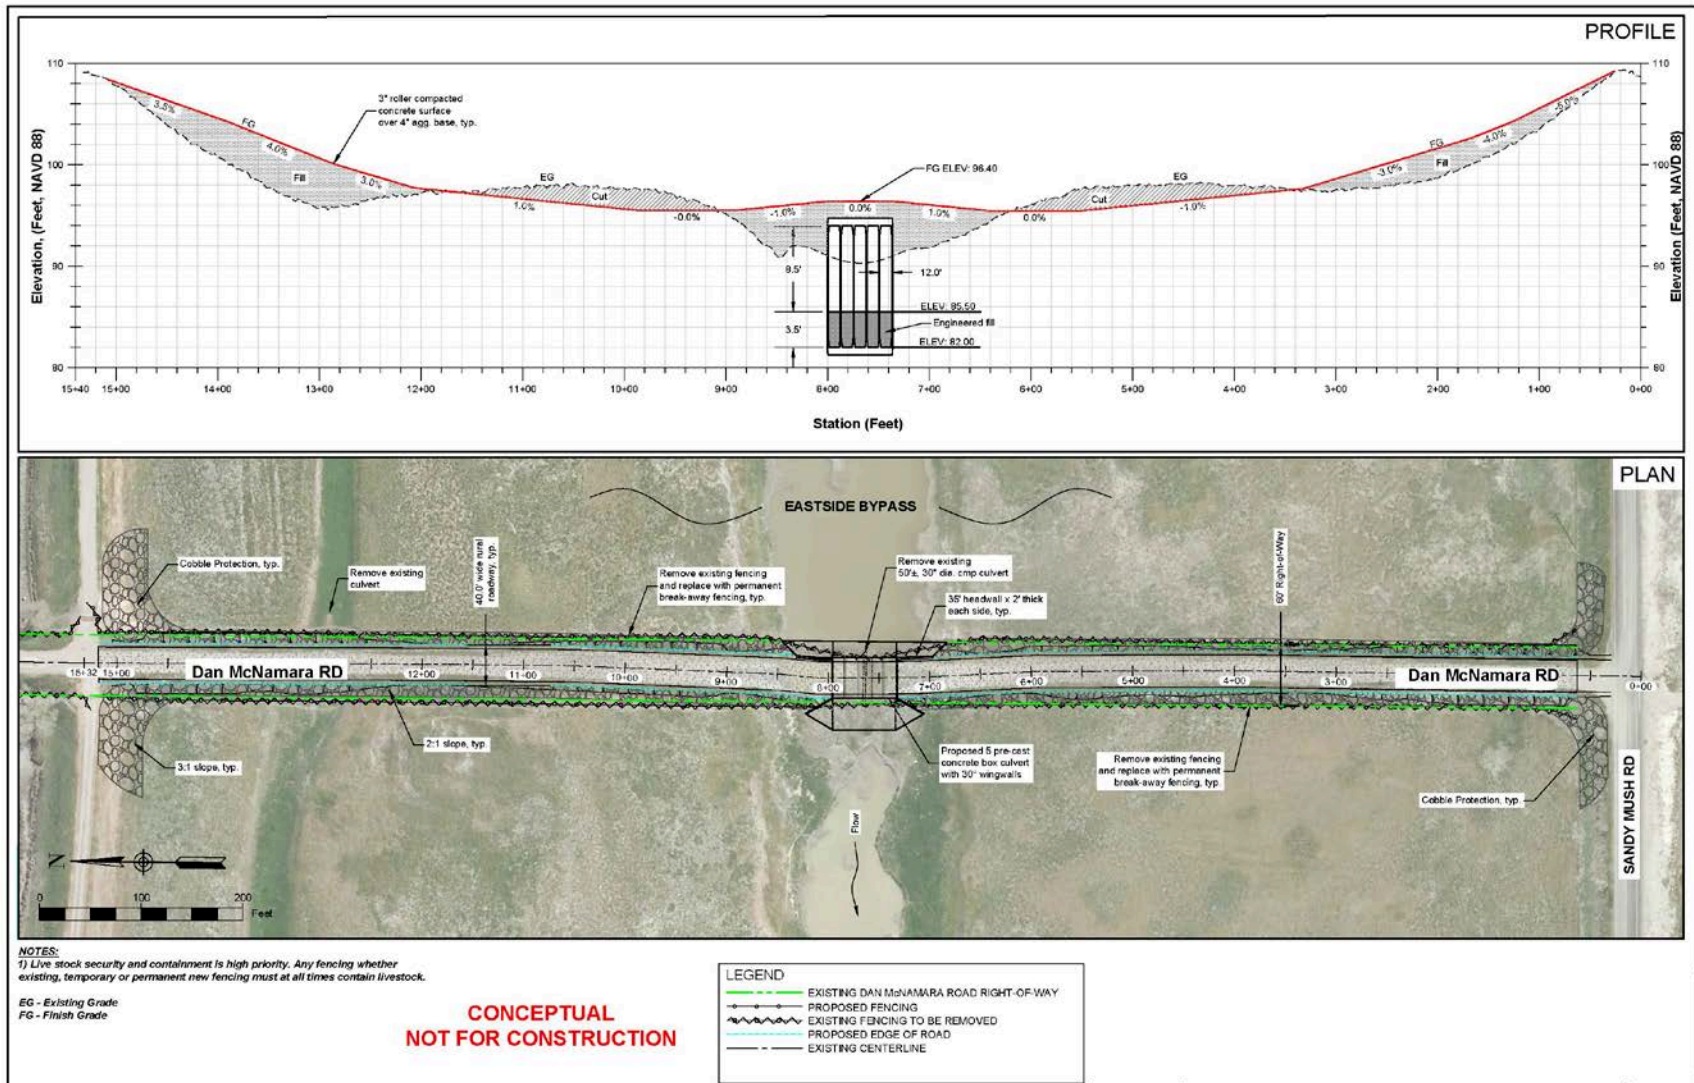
DMR-1 – Modified Low Flow Crossing with 5-Barrel Box Culvert, Profile and Plan Views of Channel Grading
